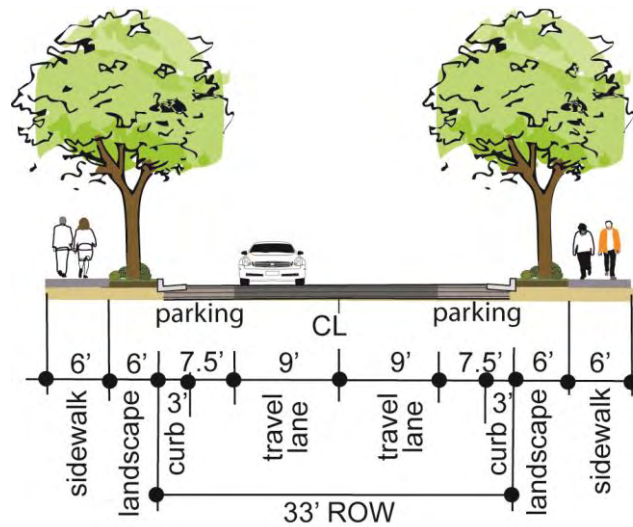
Gateway North and Gateway South (Section C on Figure 4.4-2)
